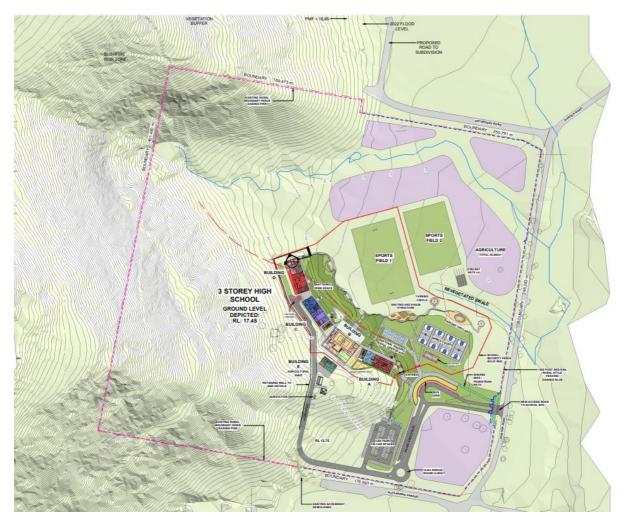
Overall Site Context Plan (Source: EJE Architecture)
